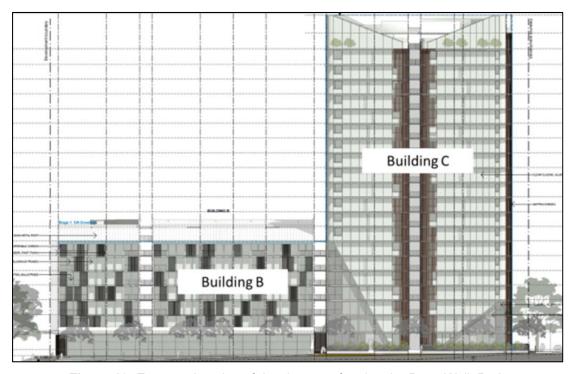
Eastern elevation of development fronting the Rope Walk Park
